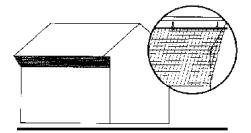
Mount netting from the outer edge of the eave down to the side of the building. Insert shows one possible method of attachment using hooks and wooden dowels.
